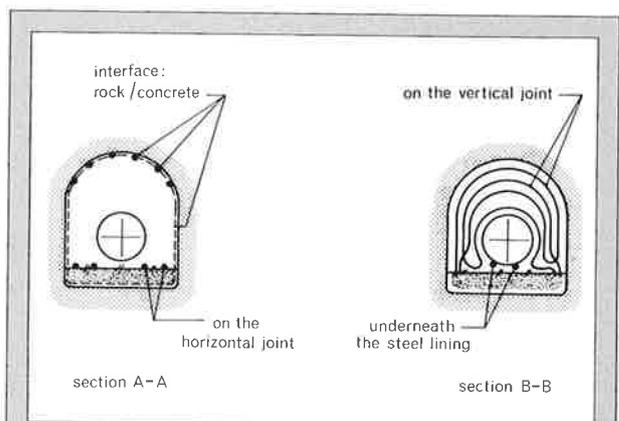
Typical sections showing the injection hoses before concreting the upper part. (All connection tubes from the injection hoses in the two sections farthest upstream were led to the cone, the rest were led to the penstock chamber).
